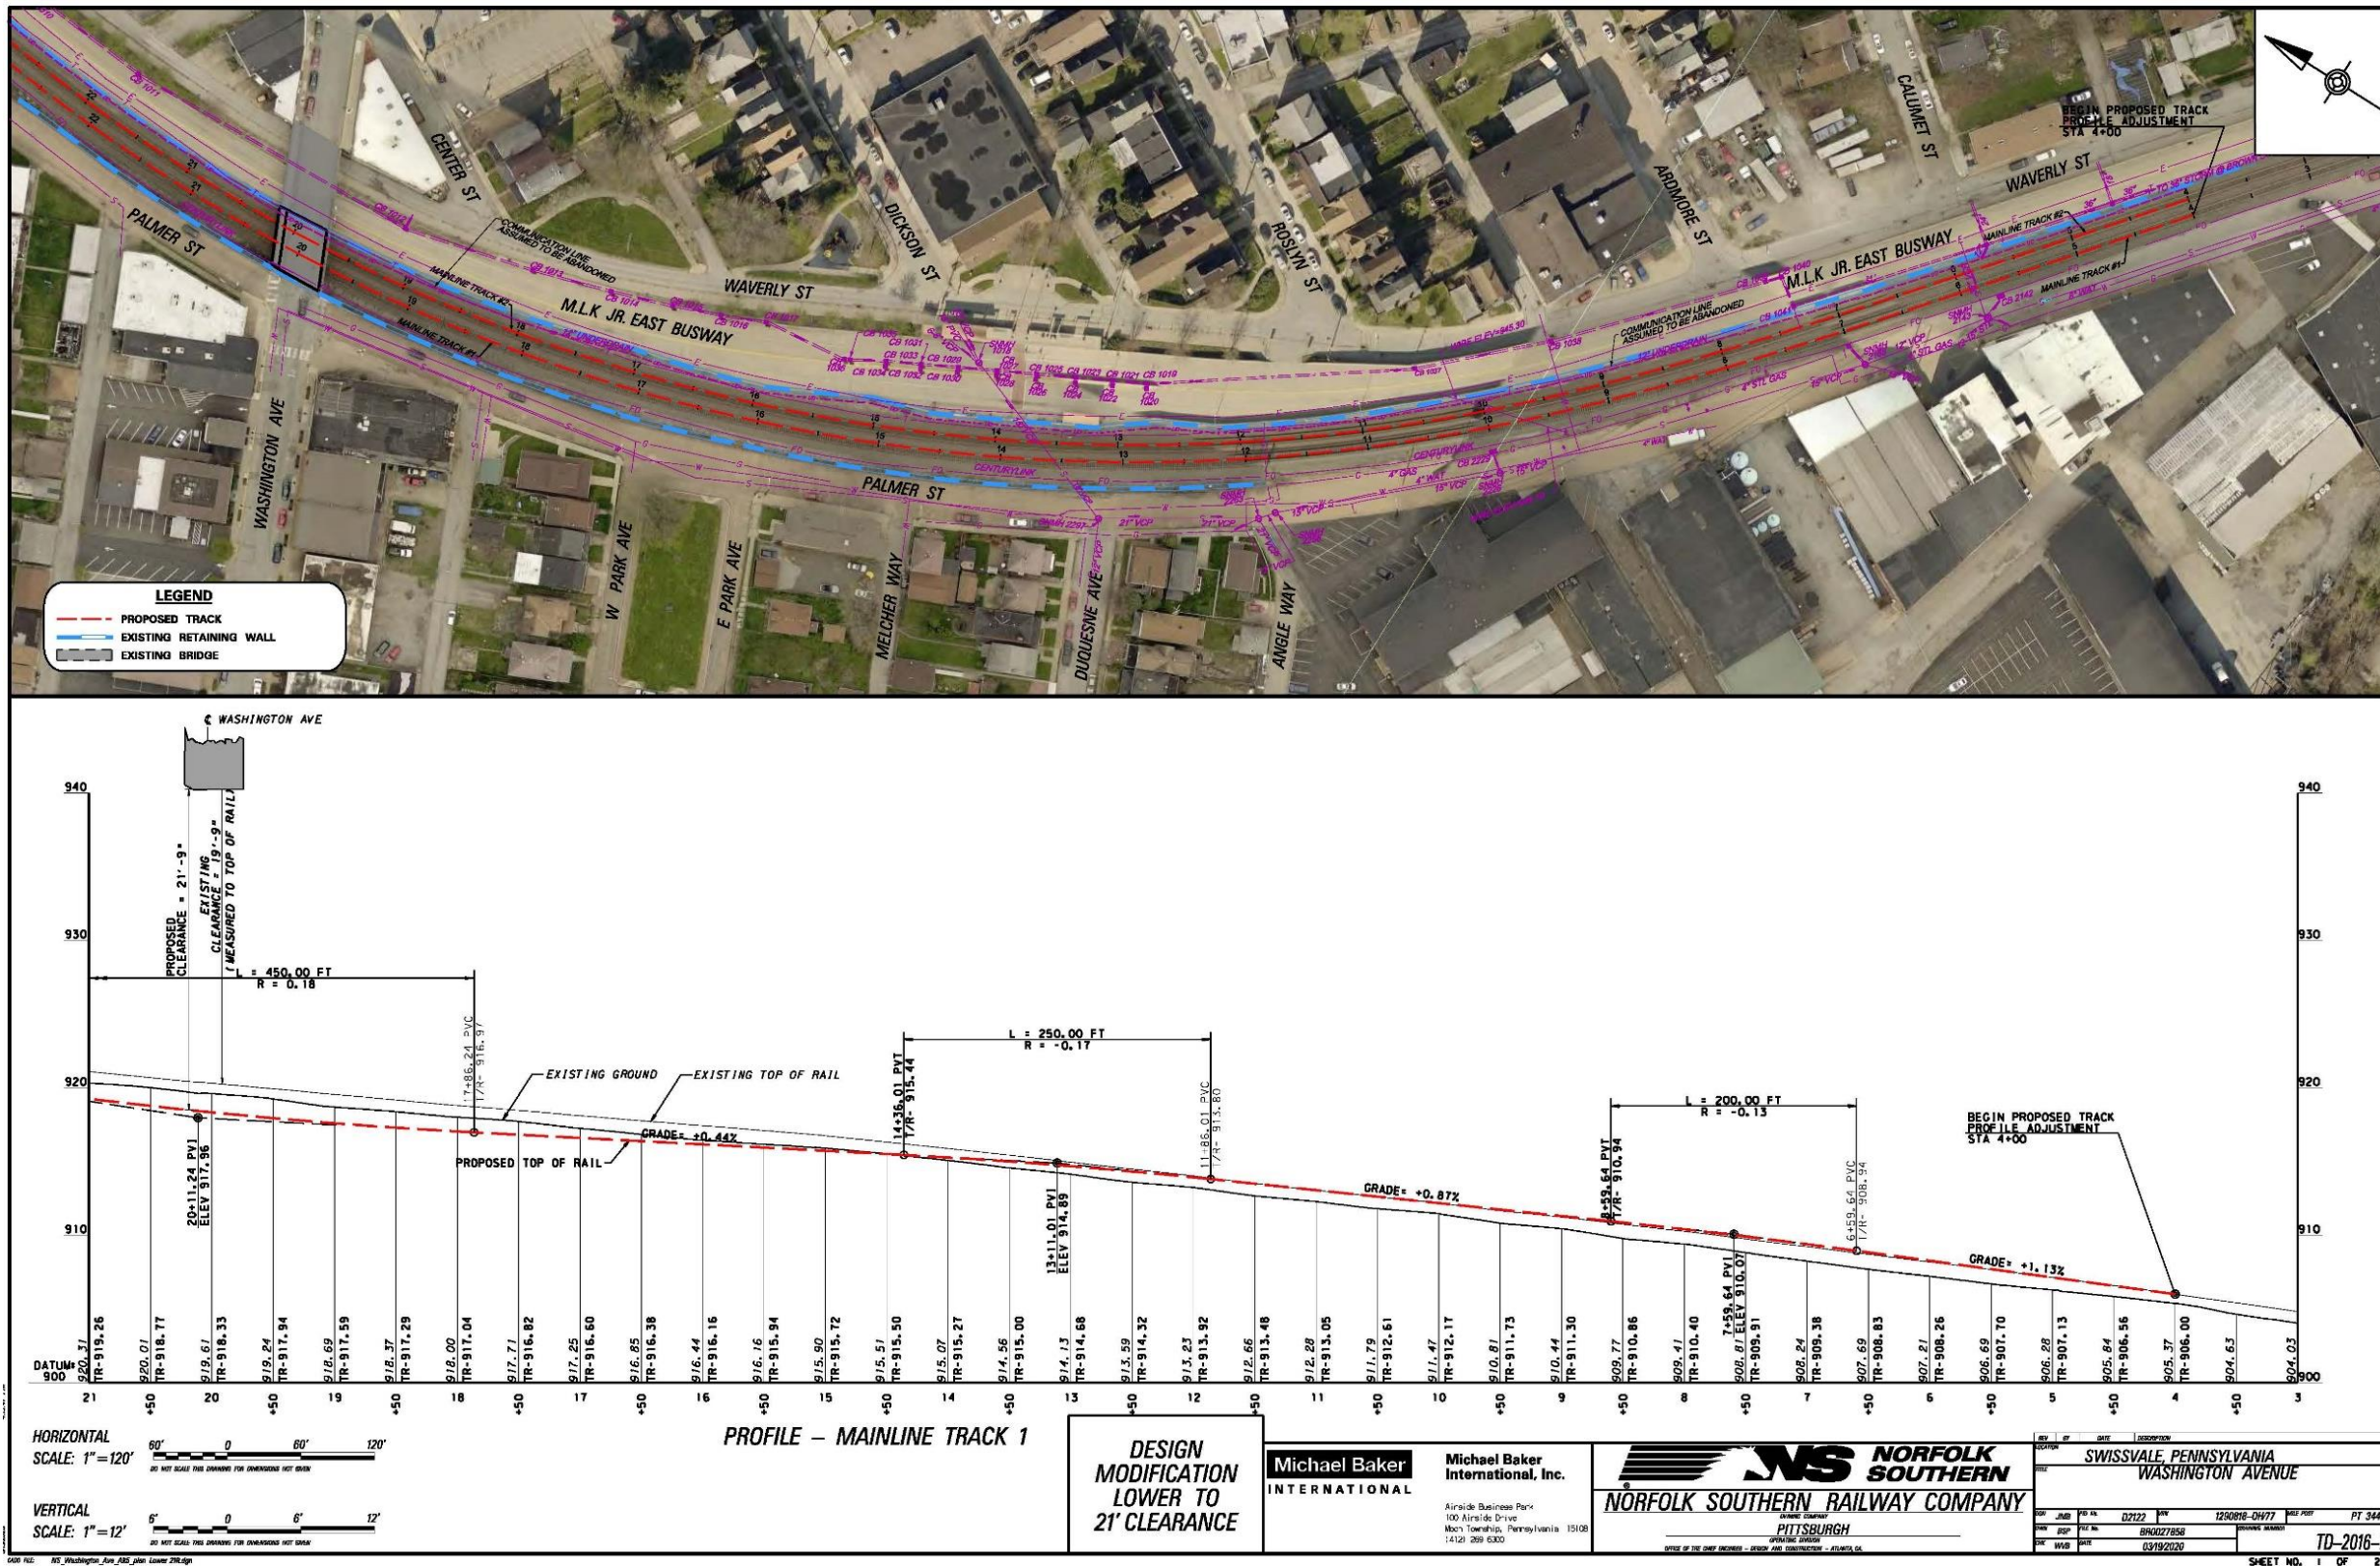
Plan and profile views of the track lowering under the Washington Avenue Bridge.
